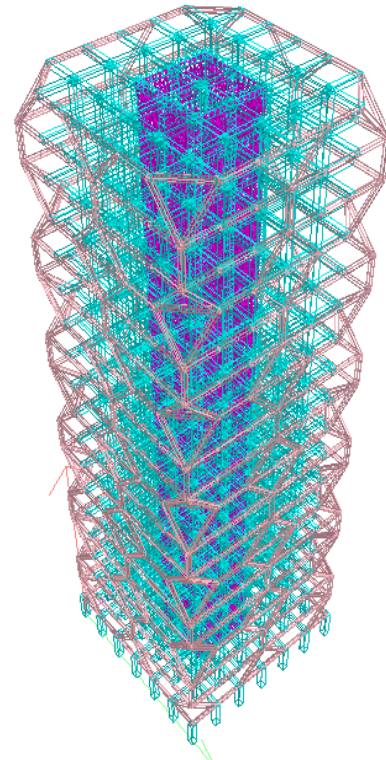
Wireframe view of shear wall+9m Octagrid module building
